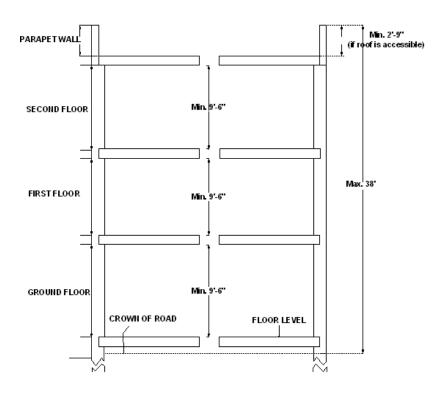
(a)i Height of Residential Building upto 25 ft wide roads
